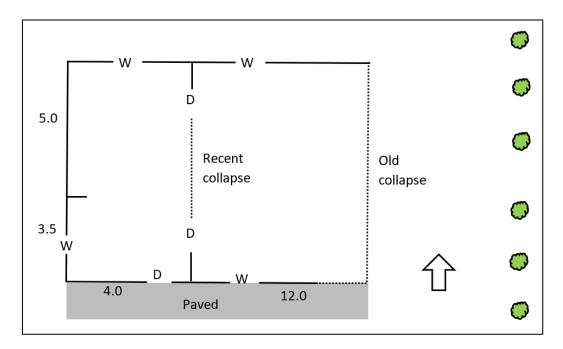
Plan of the remains of the house at waypoint 295. Six cypress trees (now dead) stand to the east of the house.
